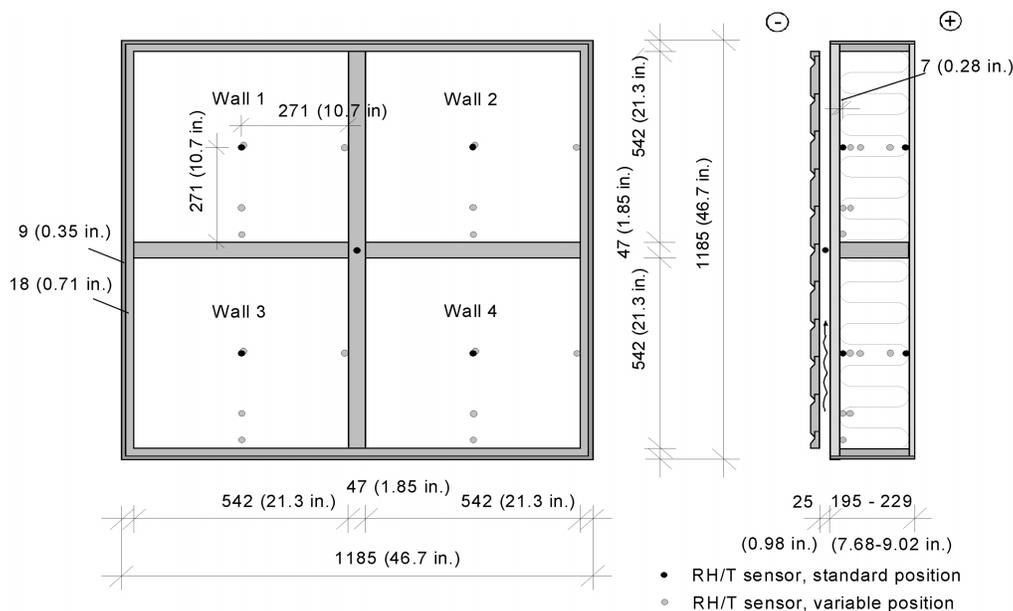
Structure of the test wall assemblies and measuring points in wall assemblies under test.
